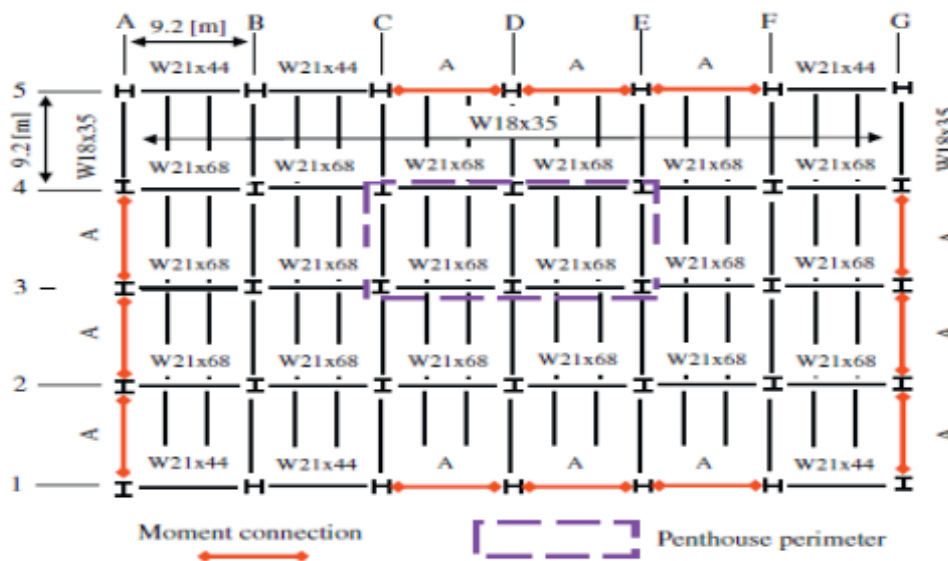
Framing Plan of the Steel Building, Courtesy “Energy Flow in Progressive Collapse of Steel Framed Building” By Stefan Szyniszewski
